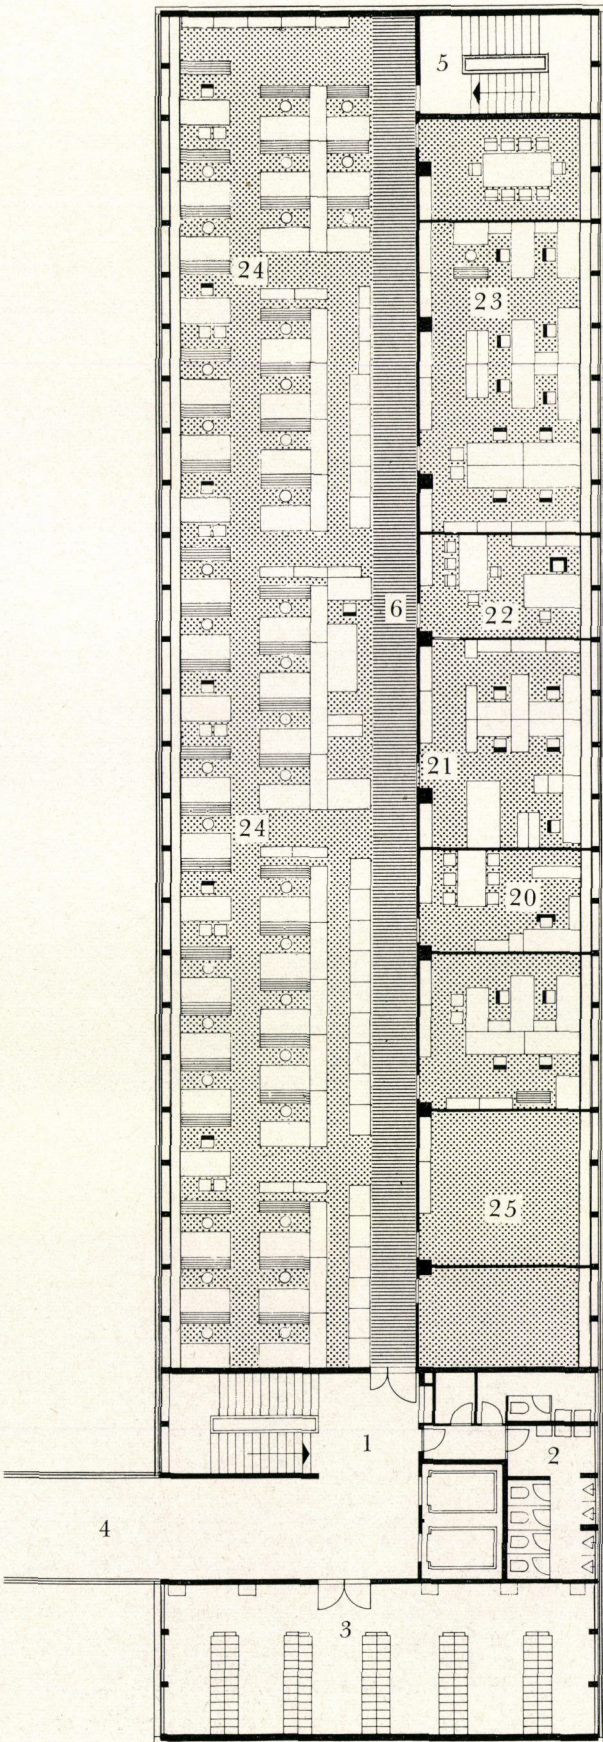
Plan of the administration office (left) and of a design department (right)
